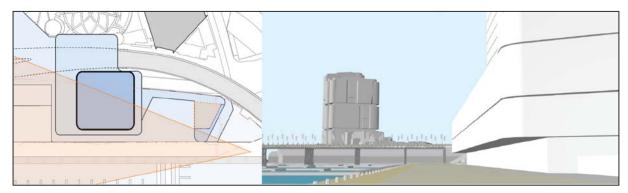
| Perspective view looking north along the foreshore promenade (notional overhang contained within building envelope) (Source: Applicant's RtS)
